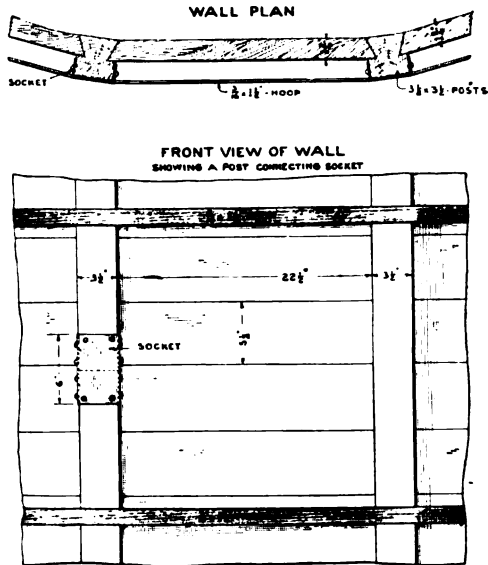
Drawing Showing the Construction of the Minneapolis Silo
